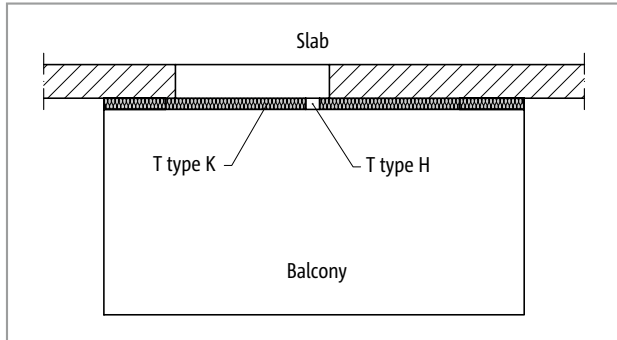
Schöck Isokorb® T type K: Balcony freely cantilevered, optional with T type H (from page 135) with planned horizontal loads, e.g. closed balustrades
